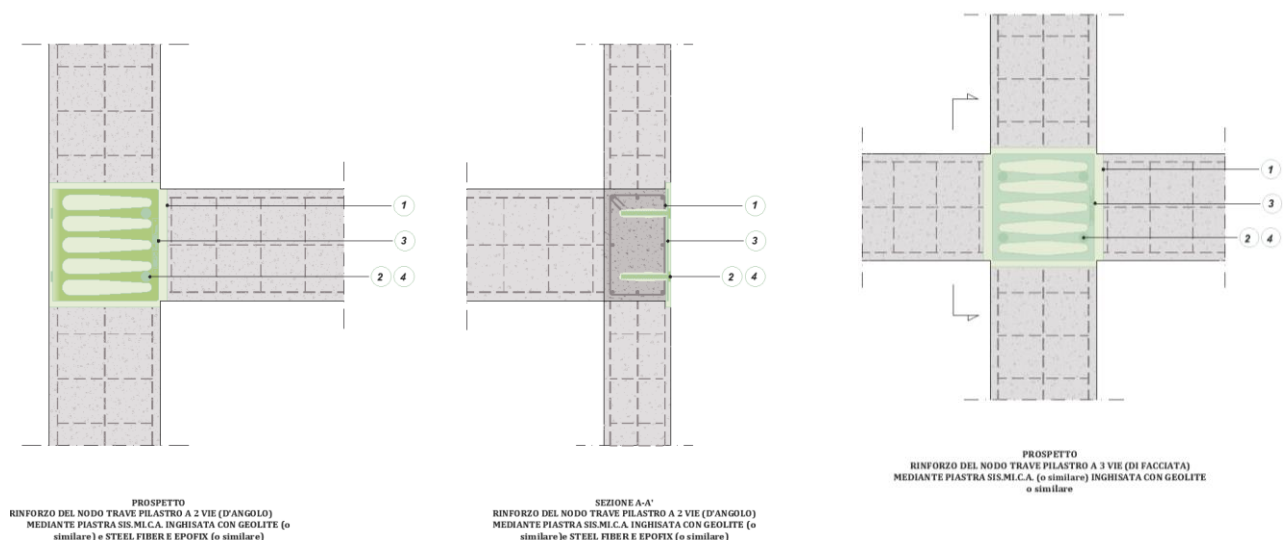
Detail of the beam-column joint intervention (façade and corner)
